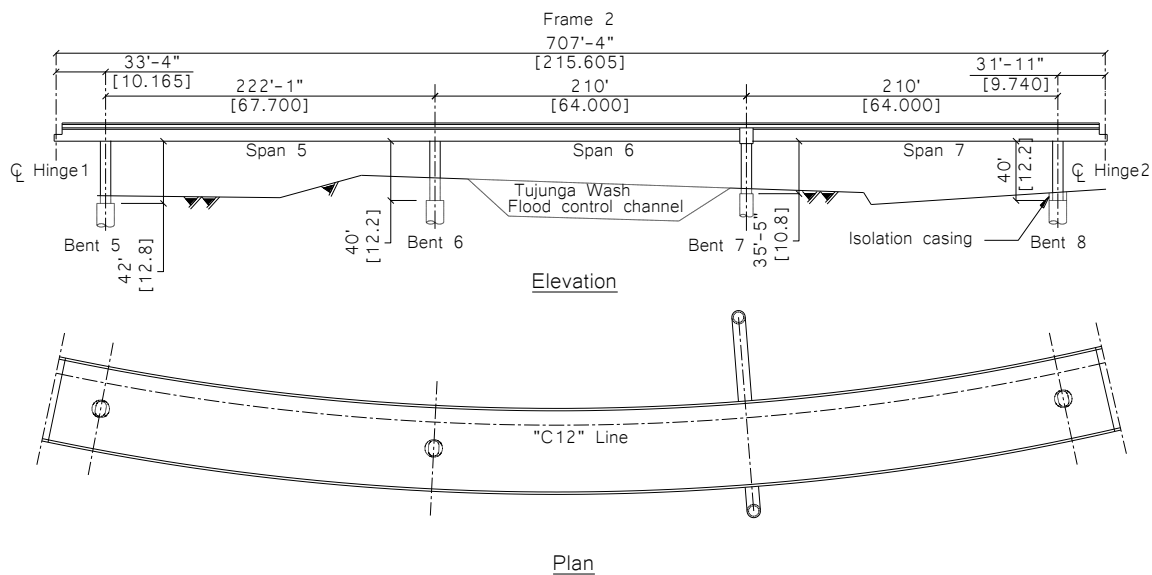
Elevation and plan of Frame 2, Bridge 2
